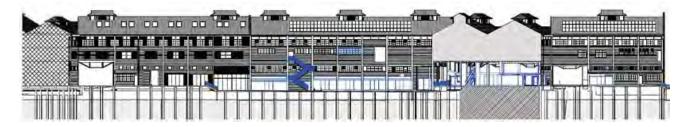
Existing and proposed Hickson Road north elevation through shore sheds (proposed alterations shown in blue)
